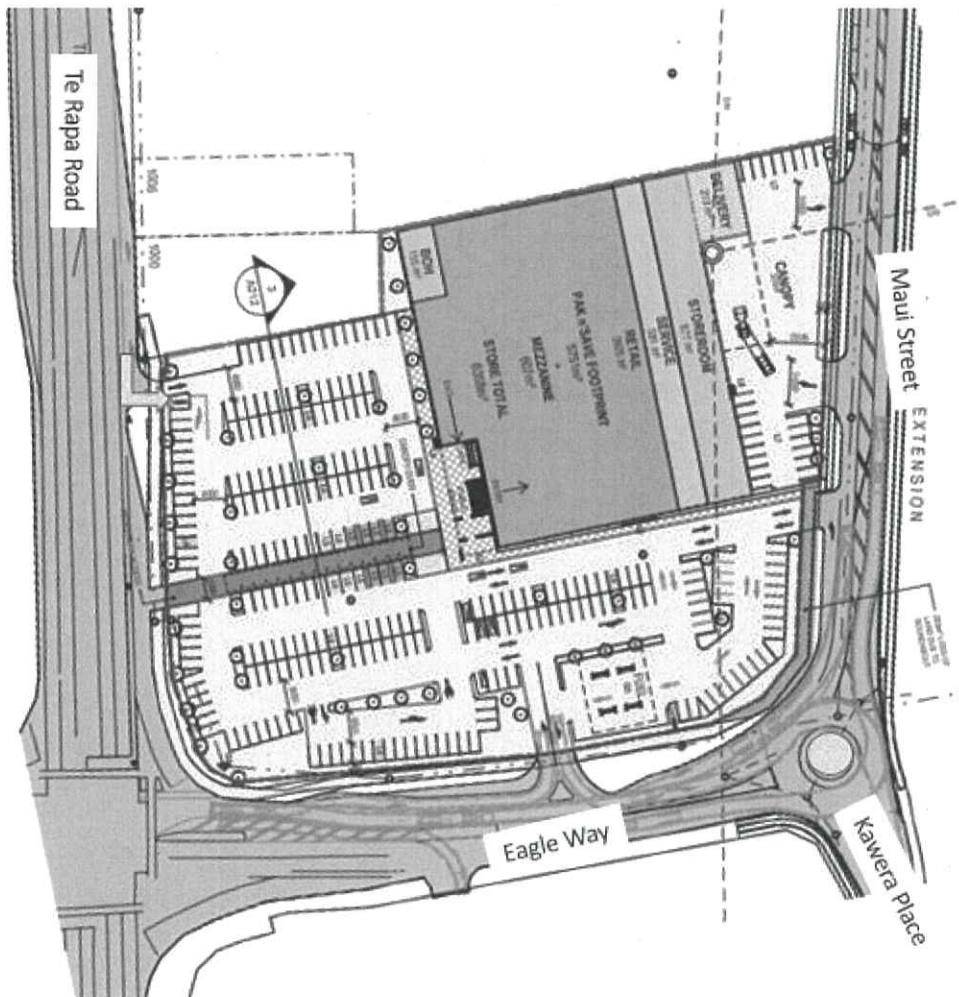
Proposed Pak n Save, Te Rapa site layout.
